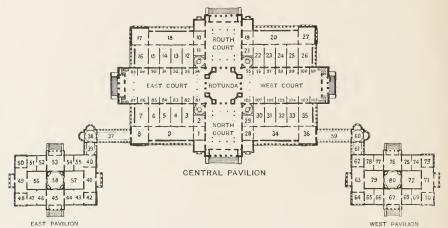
Field Columbian Museum. Plan of ground floor.
